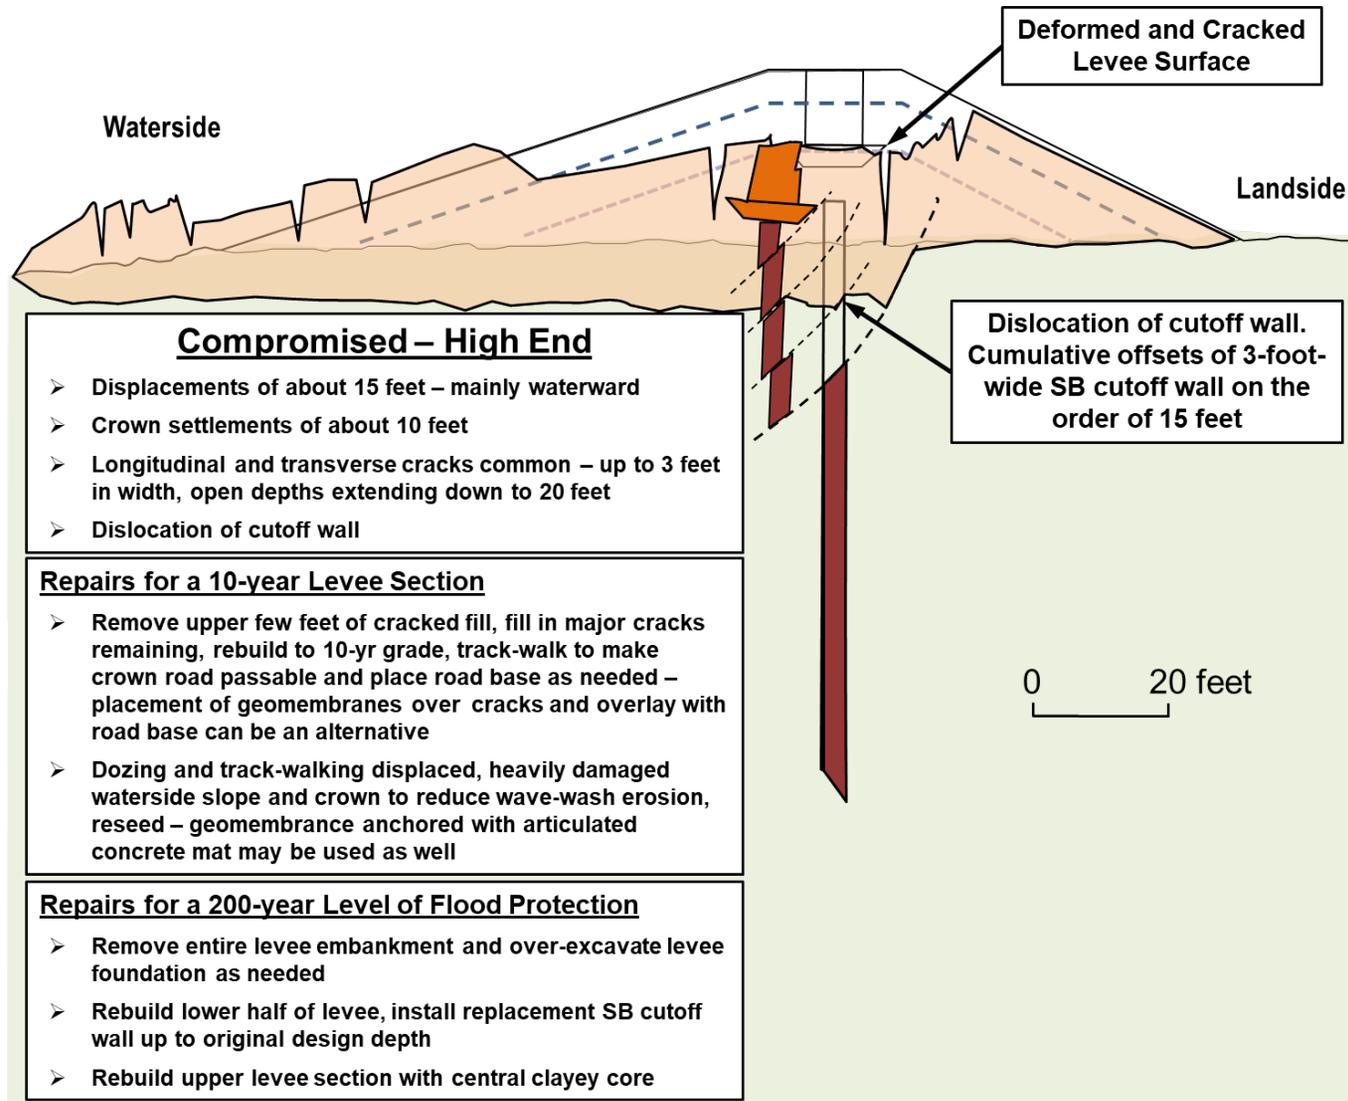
Schematic Illustration of Displacements, Settlement, and Cracking Associated with *Compromised* Damage and Repairs Necessary to Restore a 10-year Levee Section and a 200-year Level of Flood Protection
